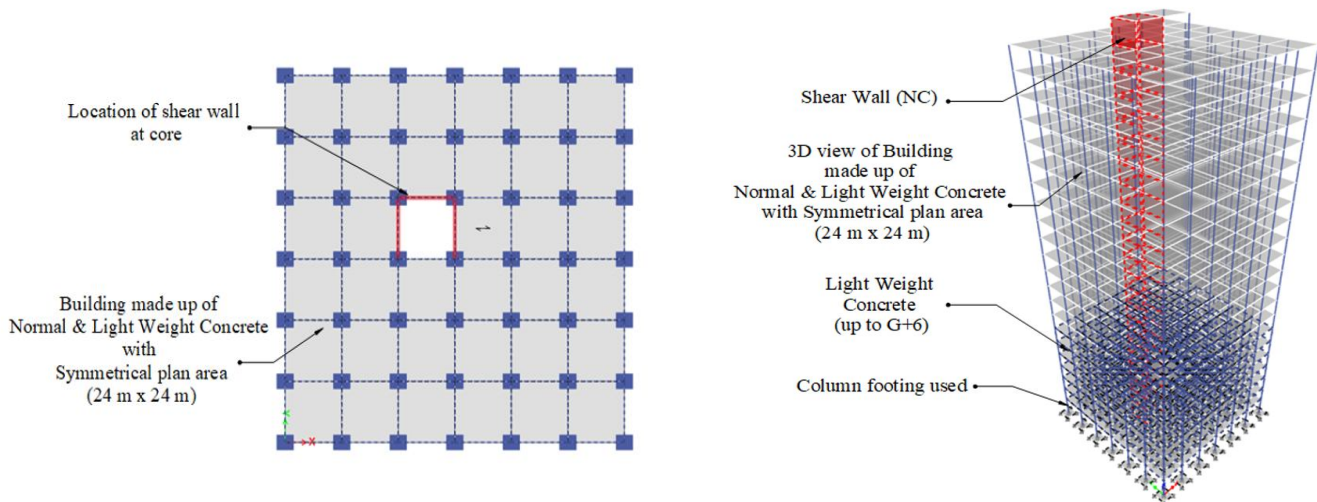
Plan and 3D view of symmetrical plan using Normal and Light Weight Concrete (NAL1)
